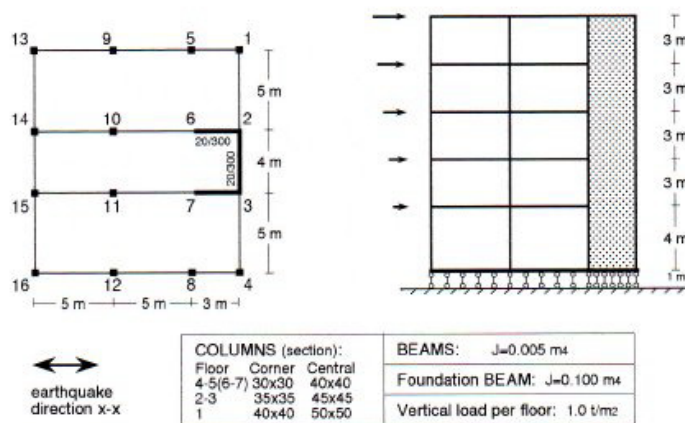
Plan view and vertical section of the five-storey (seven-storey) structure.
